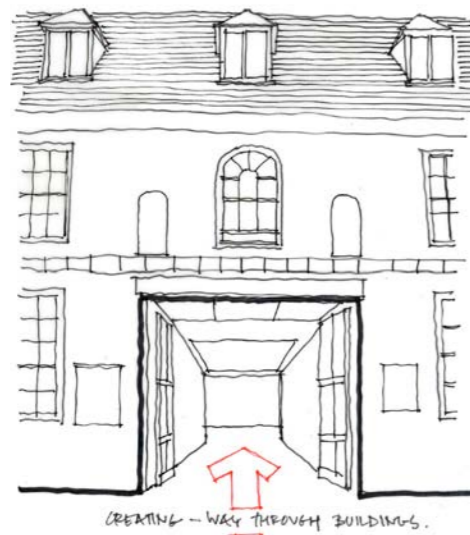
Elevation of a building on Towcester High Street highlighting the public pedestrian routes that cut through the building and enhance permeability to the Town Centre
